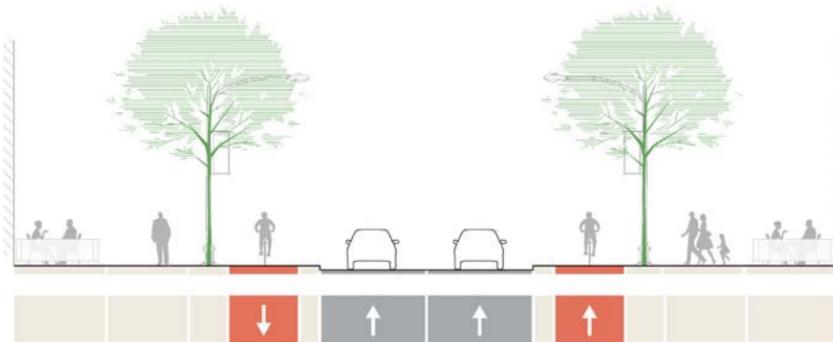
Sixth Street typical section I-35 to Brazos Street
